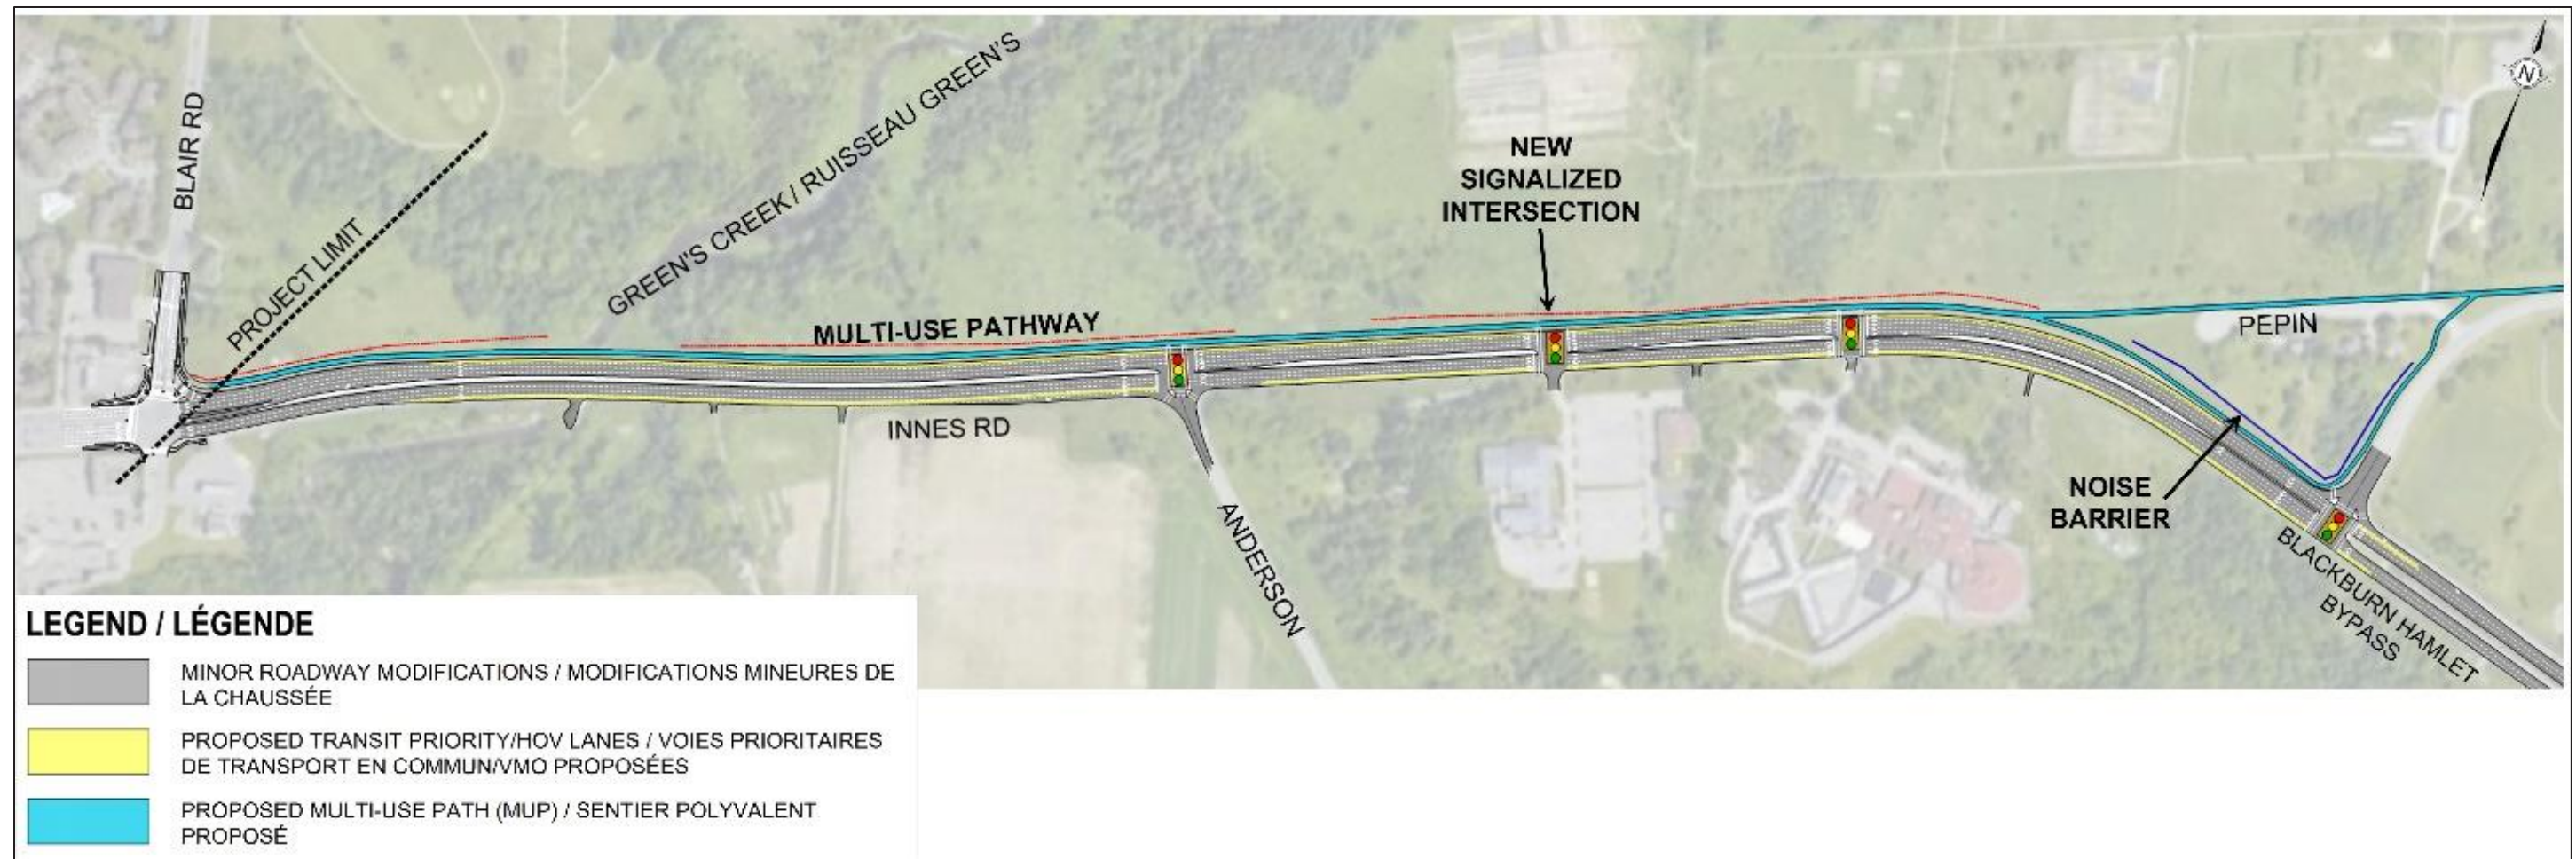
Recommended Plan – Innes Road Between BHBP & Blair Road
